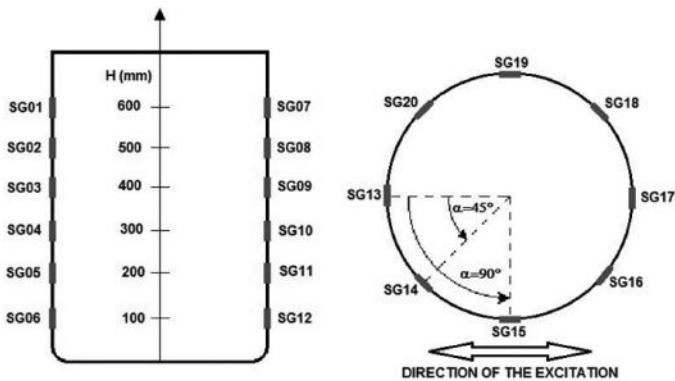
Arrangement of the strain gauges at the outer tank shell. Elevation (left) and plan view (right).
